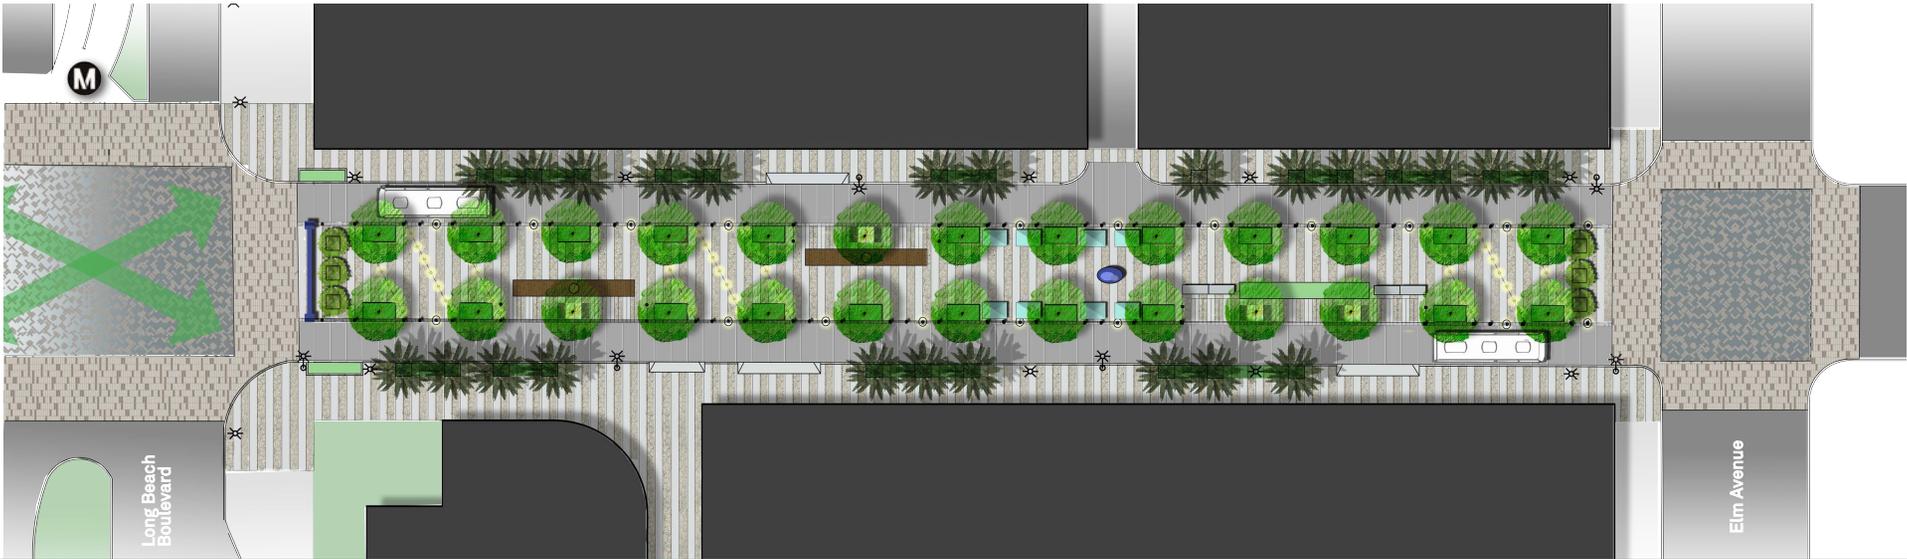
1st Street- Long Beach Boulevard to Elm Avenue
